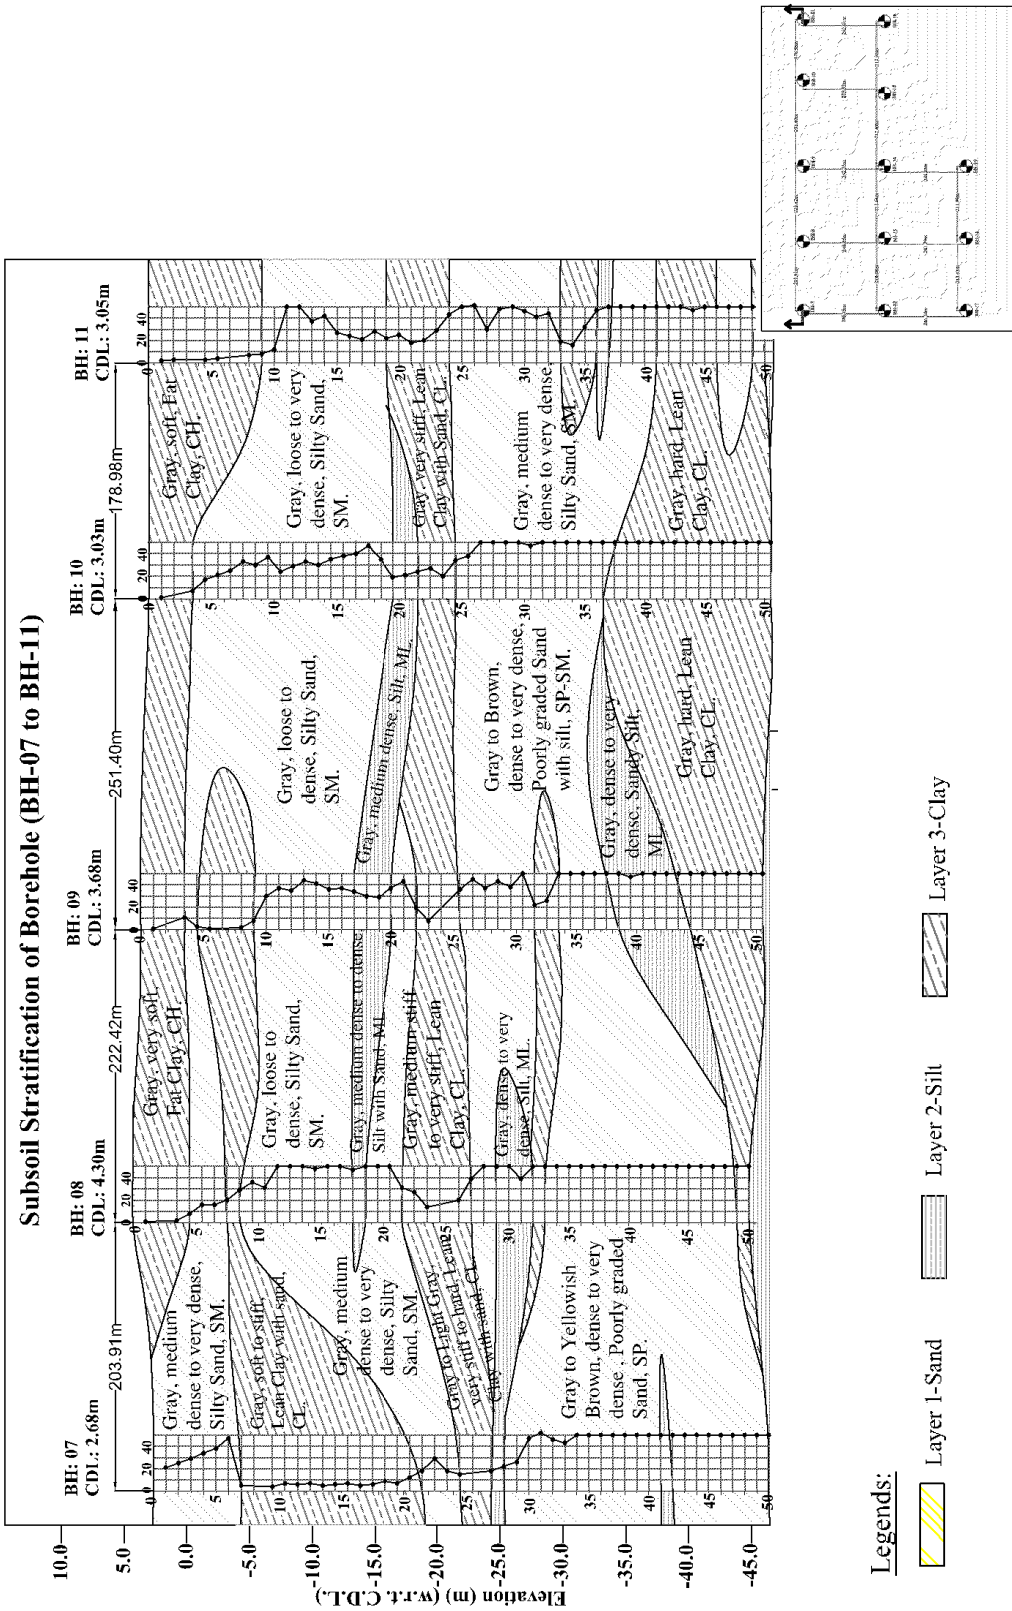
Subsurface section (BH-7 ~ BH-11)
